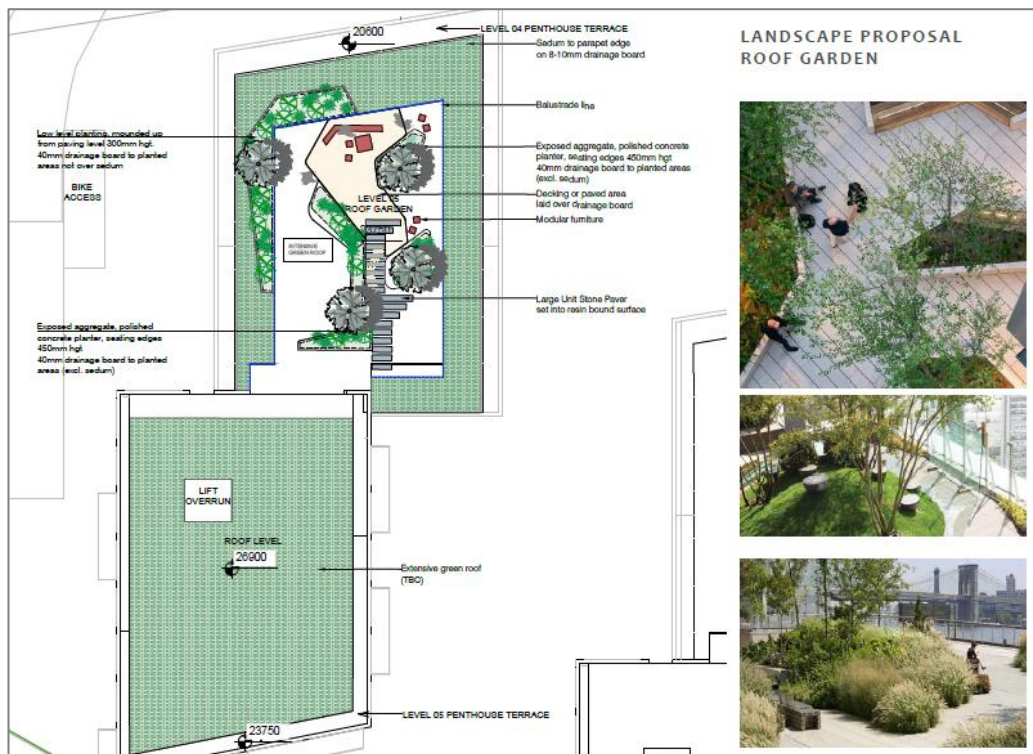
Roof Garden (Extract from Landscape Design Statement)
